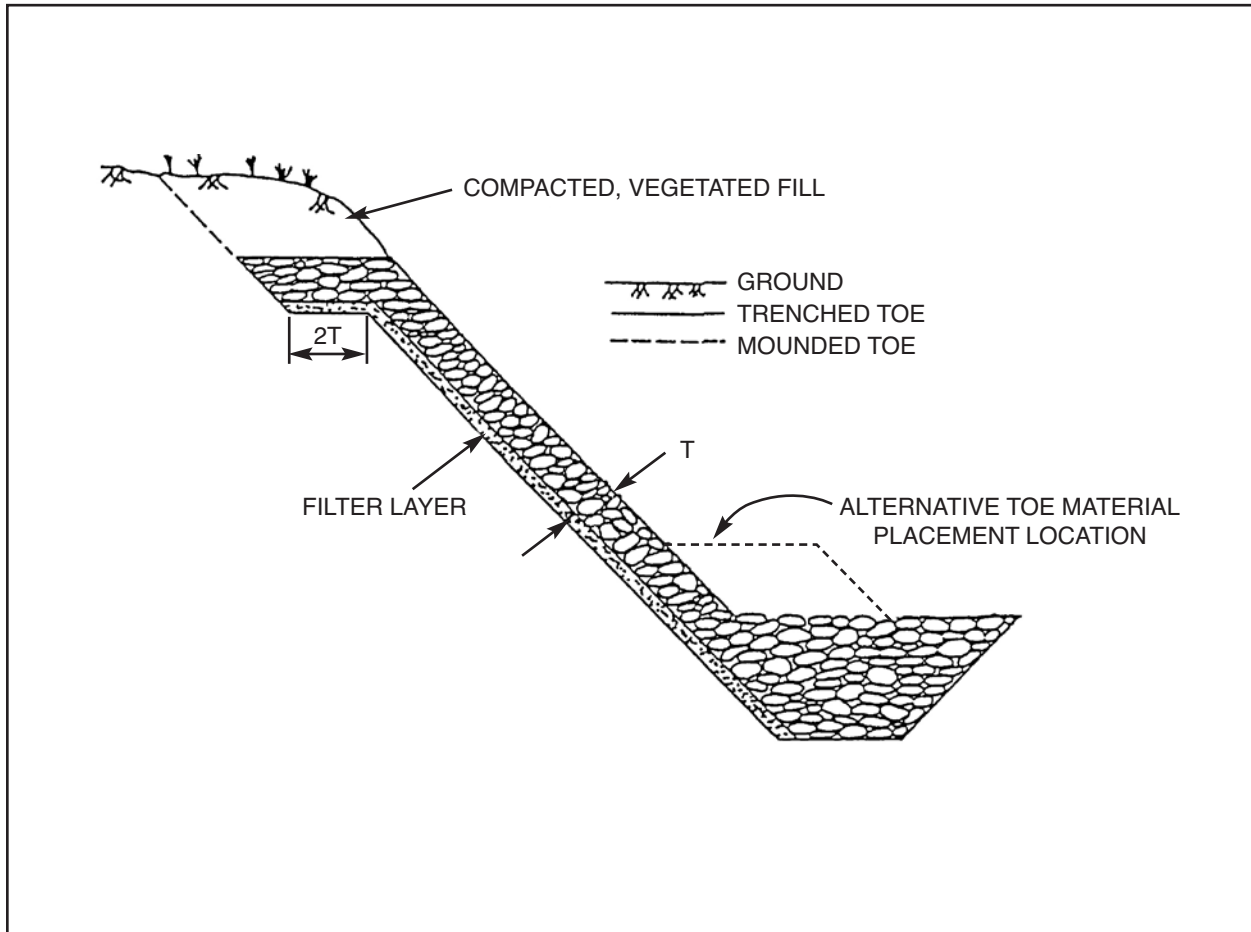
Typical Riprap Installation: End View (Bank Protection Only)
